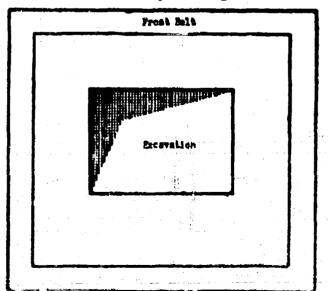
Use of Prost Belts To Prevent Water Seepage into an Excavation
